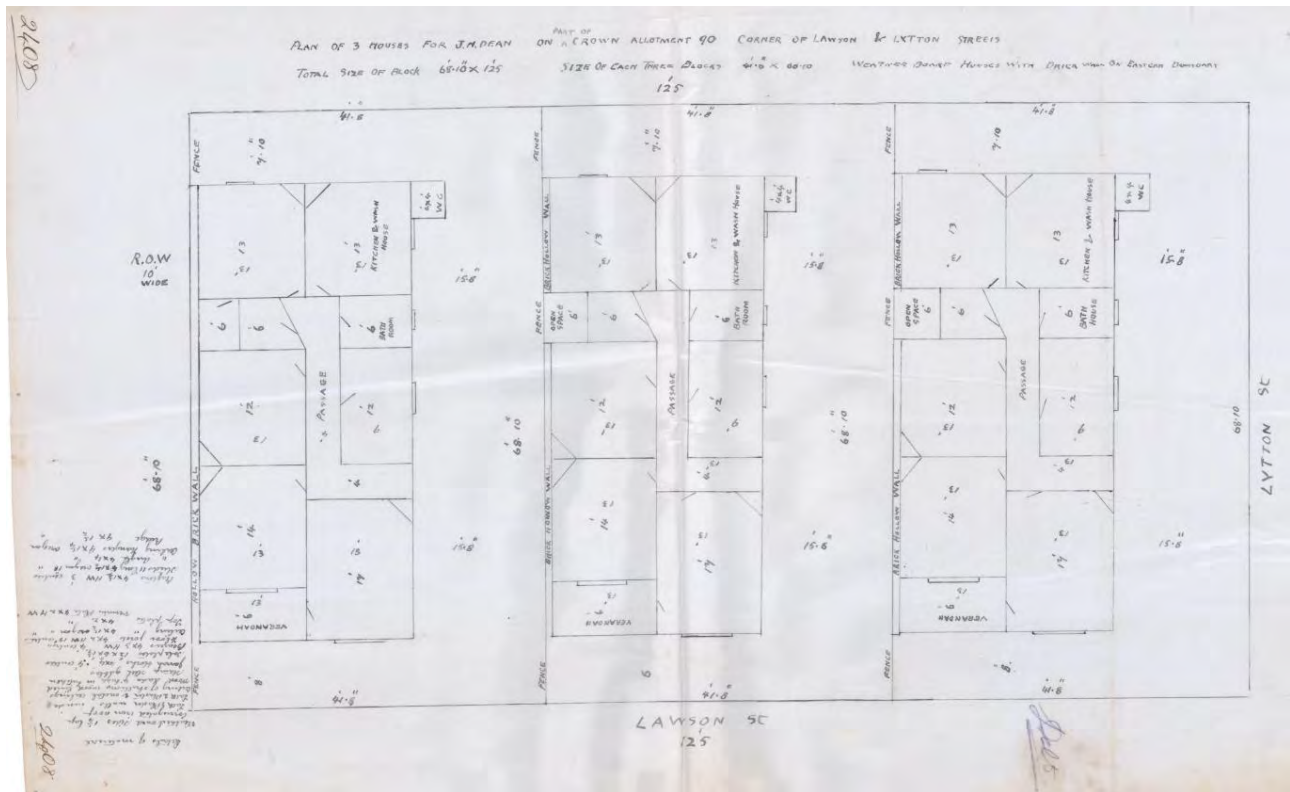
Plan of three houses on part of Crown allotment 90, corner of Lawson & Lytton Streets.
